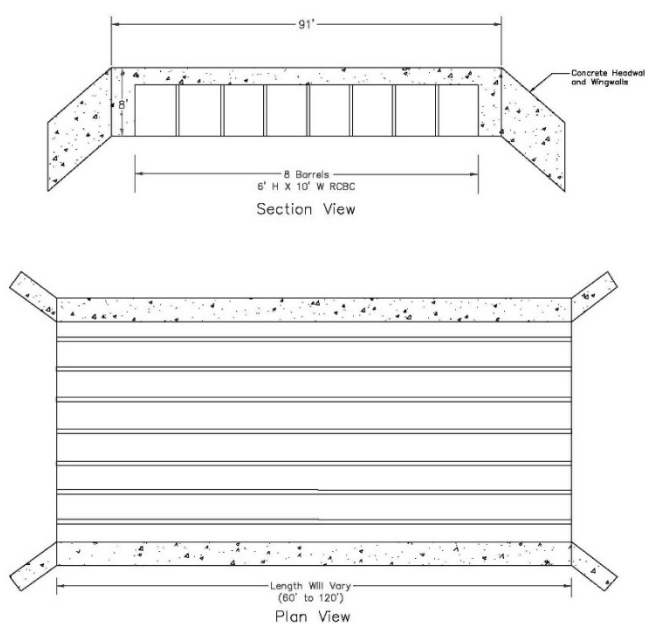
Typical Canal Road Crossing Structure – 1,500 cfs Canal
